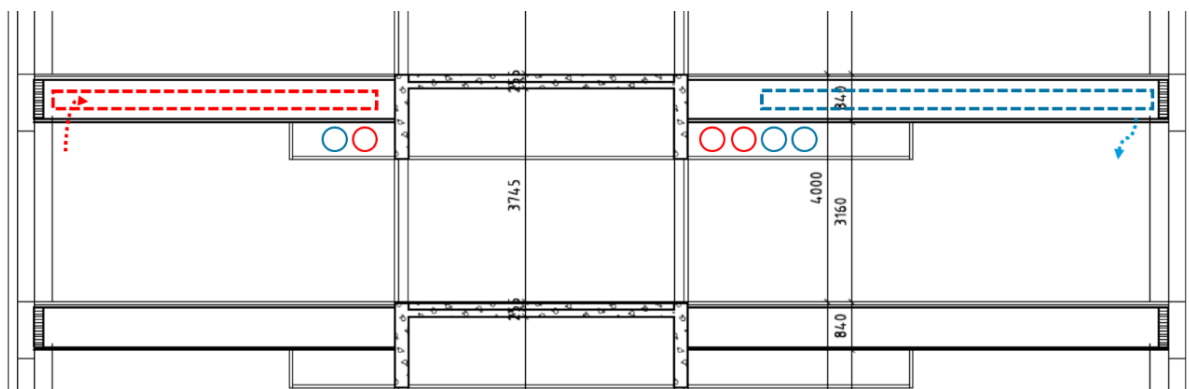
Representative cross section of the building, showing the ventilation distribution concept.
